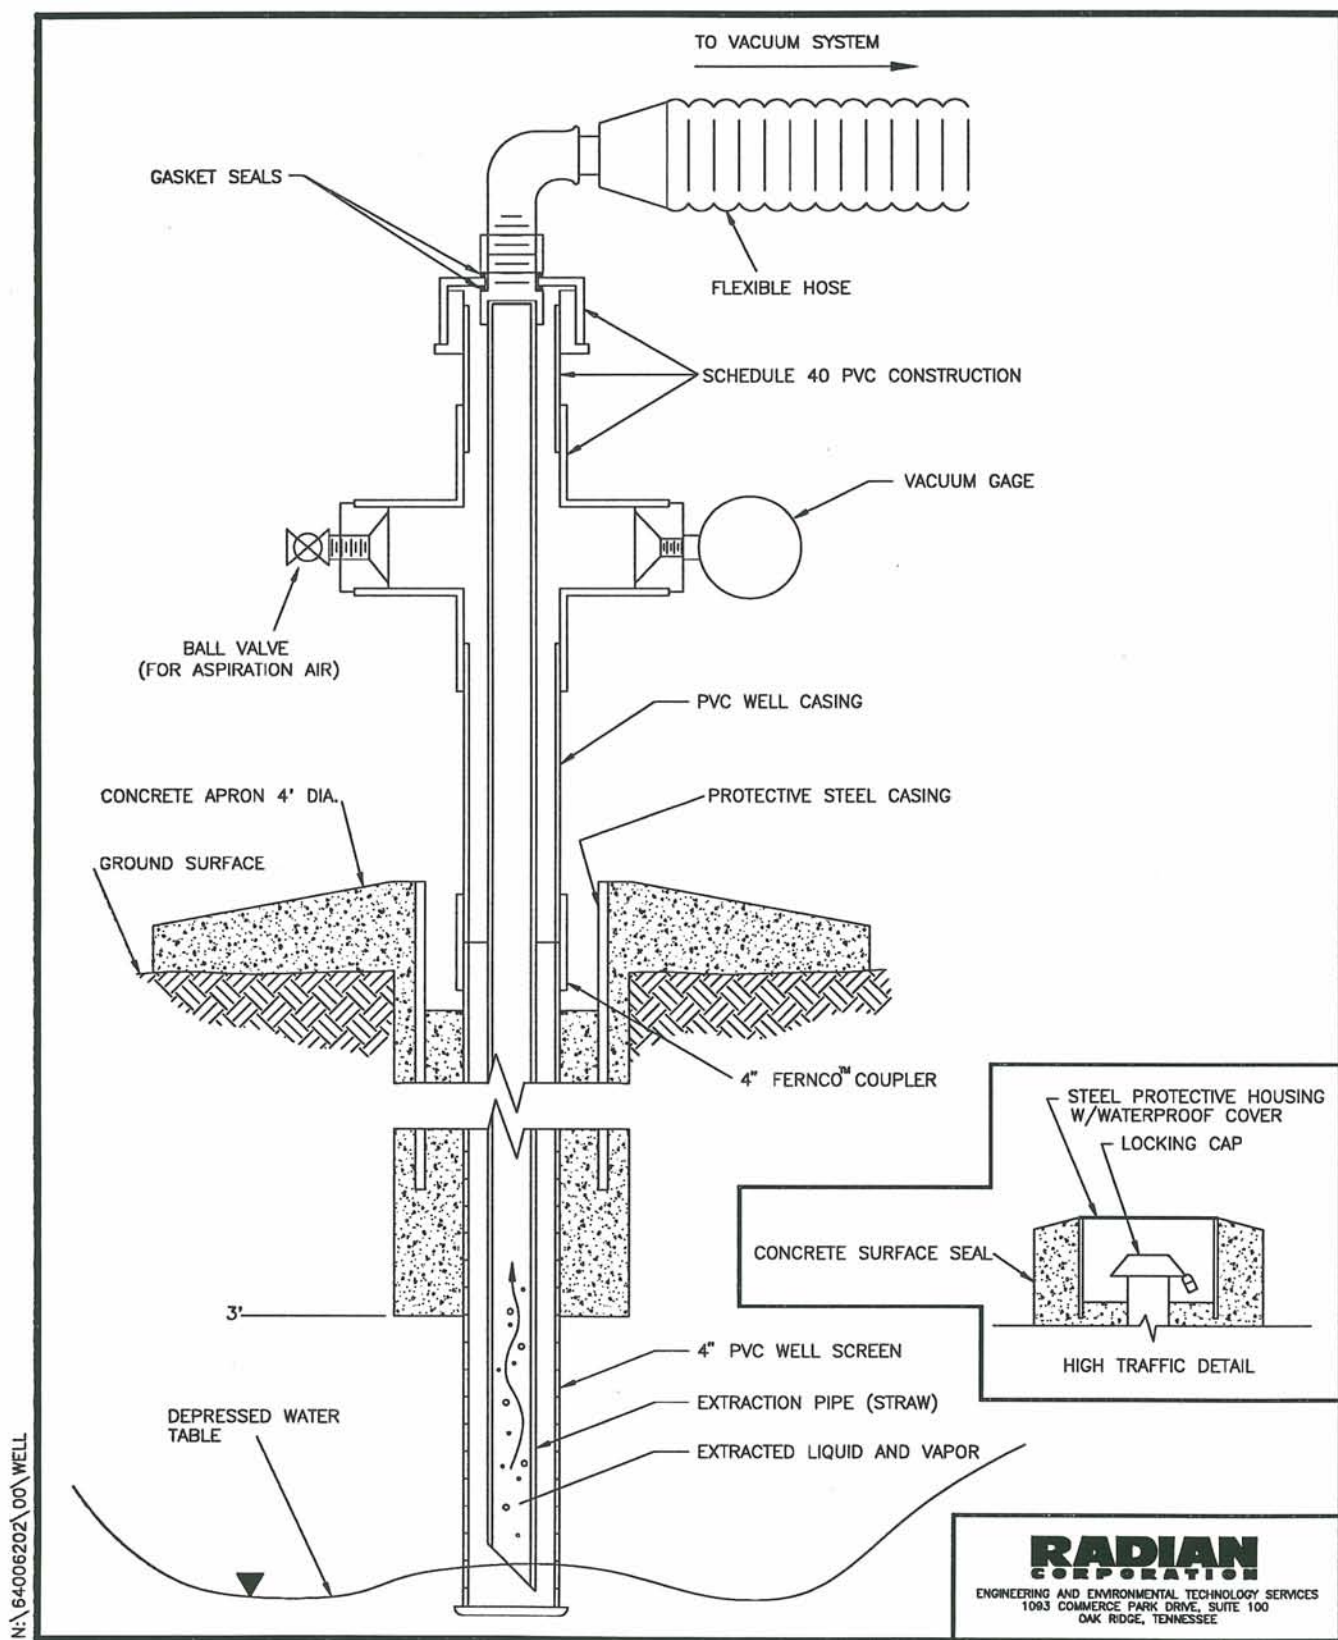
2-PHASE Wellhead Assembly and Extraction Well
